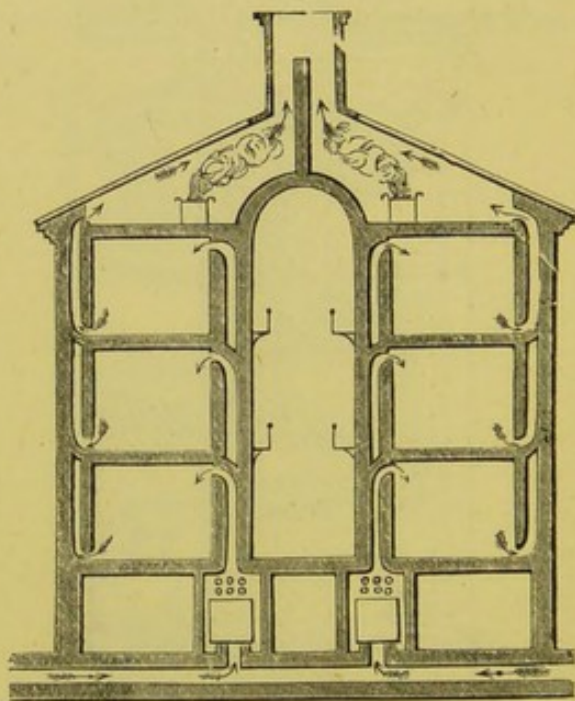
SCHEME OF VENTILATION OF A PRISON (JEBB'S SYSTEM).
